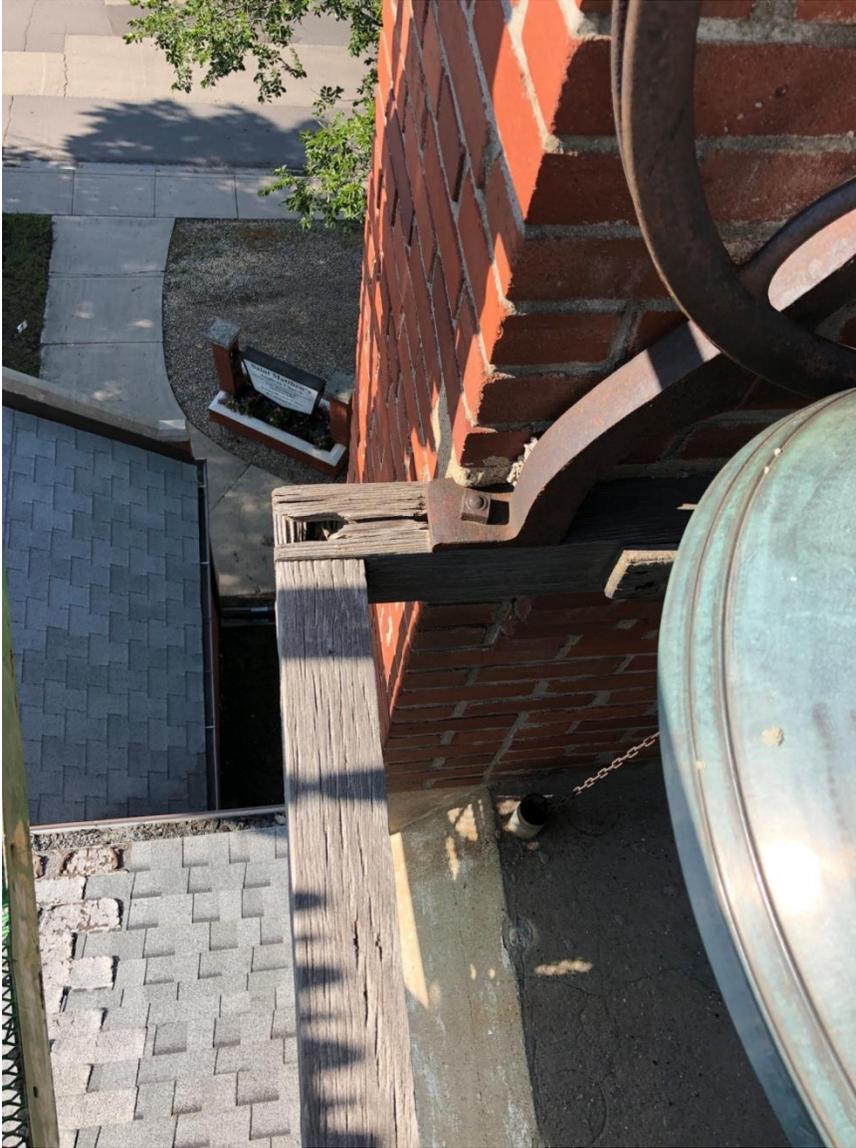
View of the Loose and Deteriorated Wood Member on East Side
